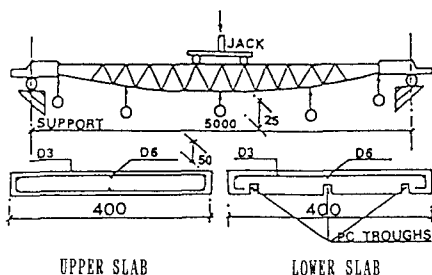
Details of Specimen and Loading Arrangements.(All Dim. in mm).
